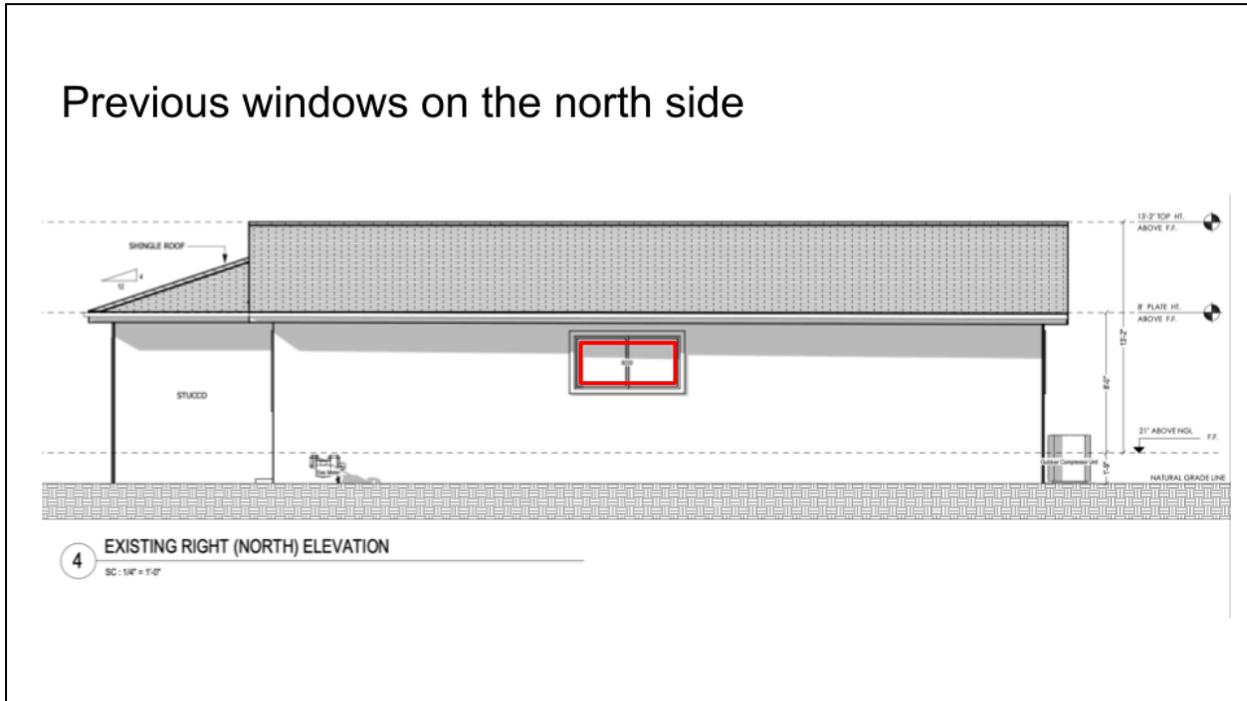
Previous window (only 1) of 1585 Mallard Way facing our property
